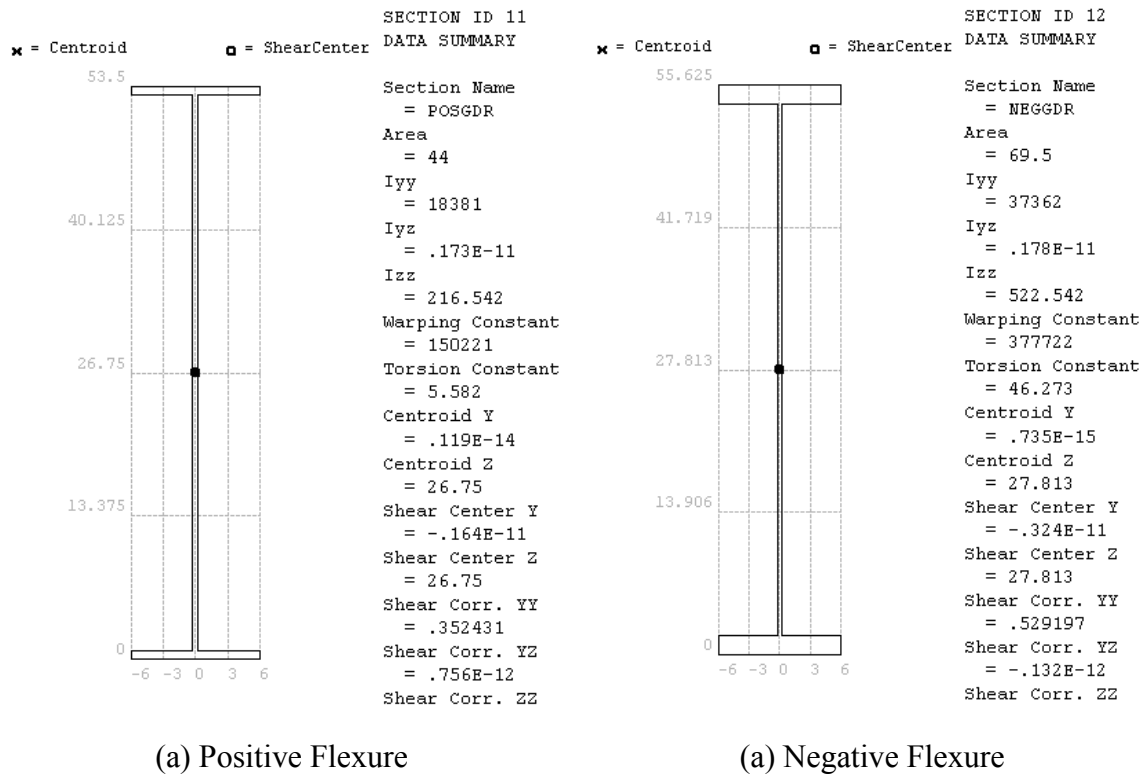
Cross Section of Steel Plate Girder (units are inches).
